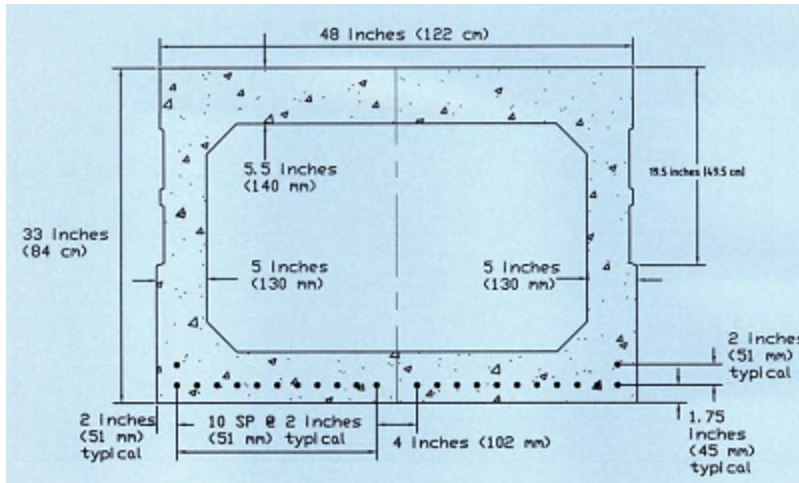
Miller shear key test member (Miller et al., 1999)
